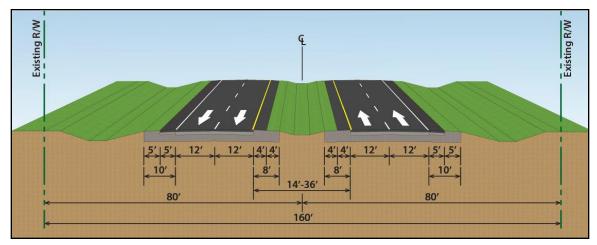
Proposed Roadway Typical Section 1 from CR 54 to North of Townsend Road
